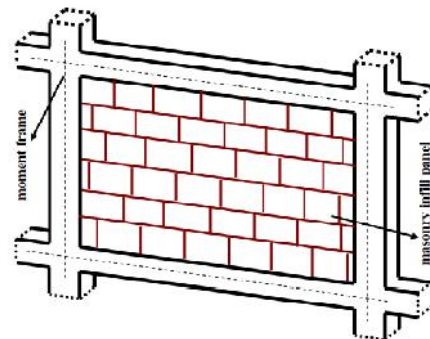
Masonry infill walls (Dilmac et al., 2018)
